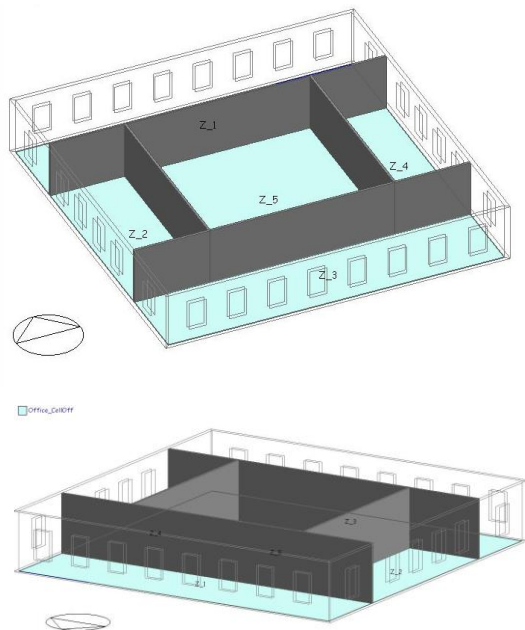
Model of the floor plan with the thermal zones - Case A
